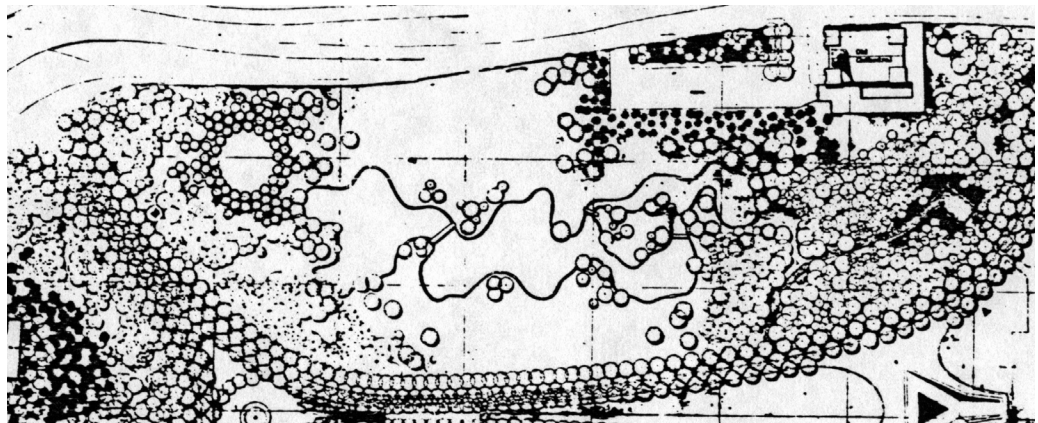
Detail of south pond plantings, Kiley final conceptual planting plan, 1964 (JNEM Archives, Record Unit 120, Drawer 12, Folder 10).
